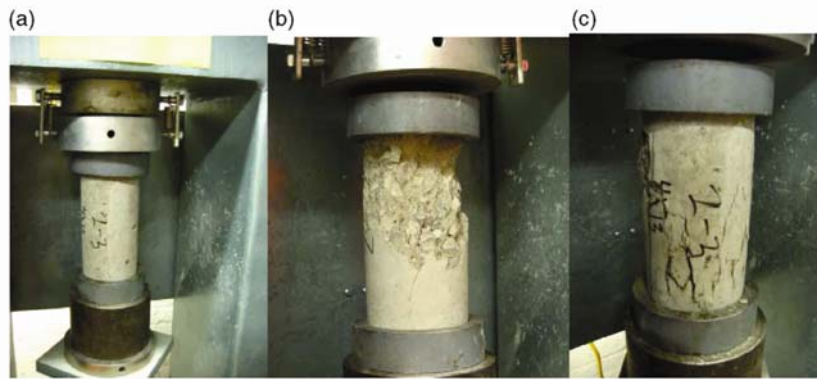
Cylindrical specimens before and after compression test (a) Before test (b) Specimen without RAP after test (c) Specimen with RAP after test.
